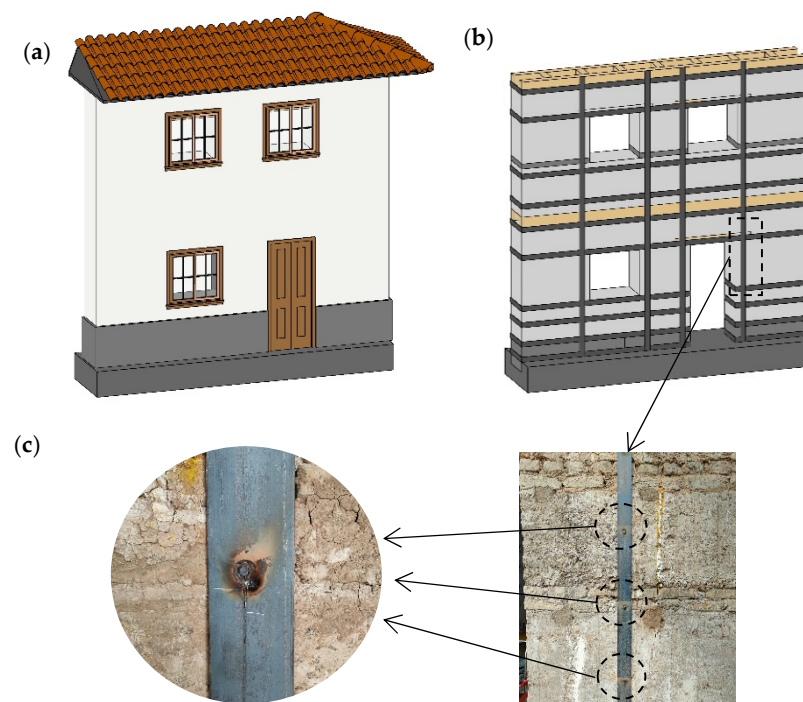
(a) Typical façade of an Andean heritage earthen house; (b) reinforcement of the earthen wall with steel plates; and (c) pass-through rods/bars placed every 500 mm.
